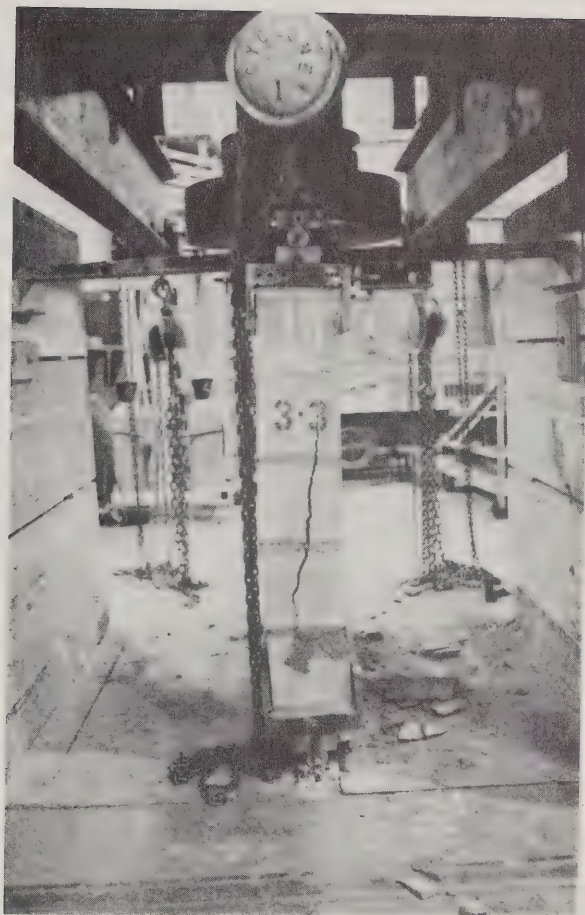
Failure of Short Wall Specimens with 3-#3
